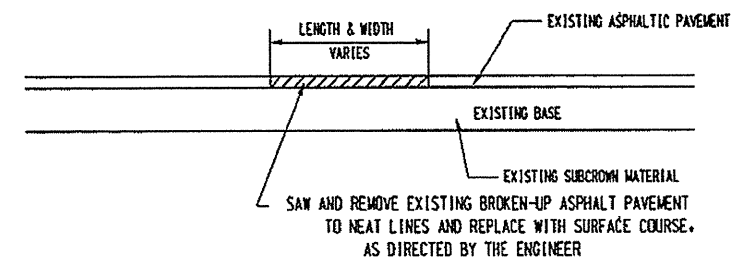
DETAILS OF REPAIRING EXISTING PAVEMENT PRIOR TO RESURFACING FOR FULL DEPTH AND MILLING
